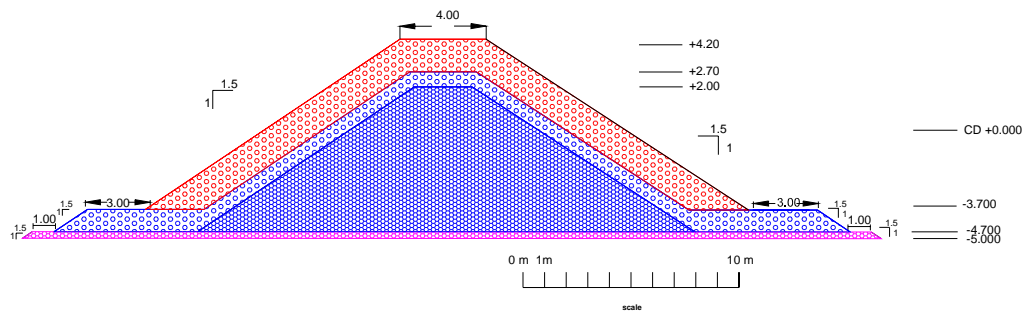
Cross section of trunk portion between water depths 3 to 5m
